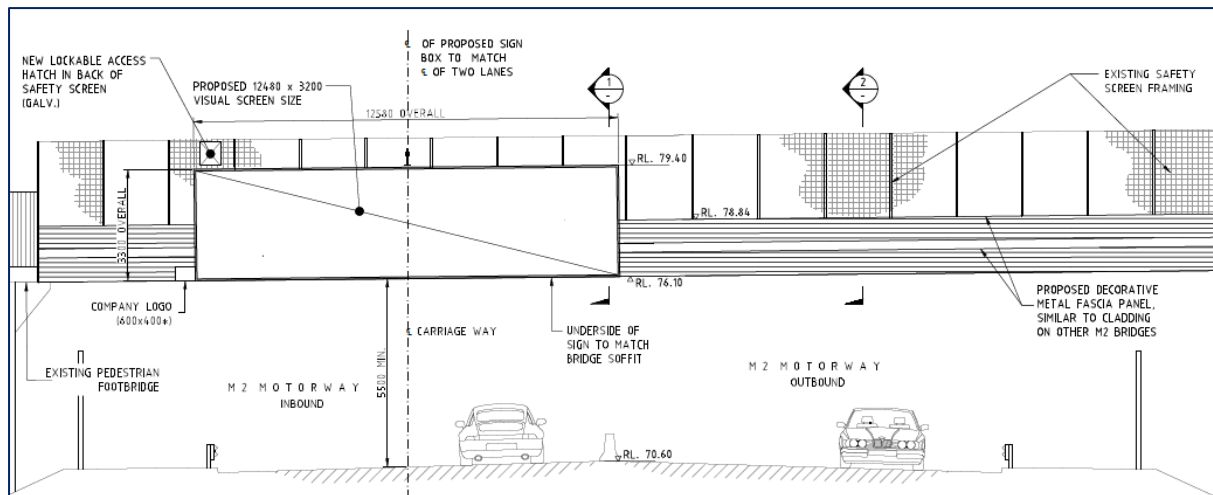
| Plan of the proposed sign (Source: Applicant's SEE)
